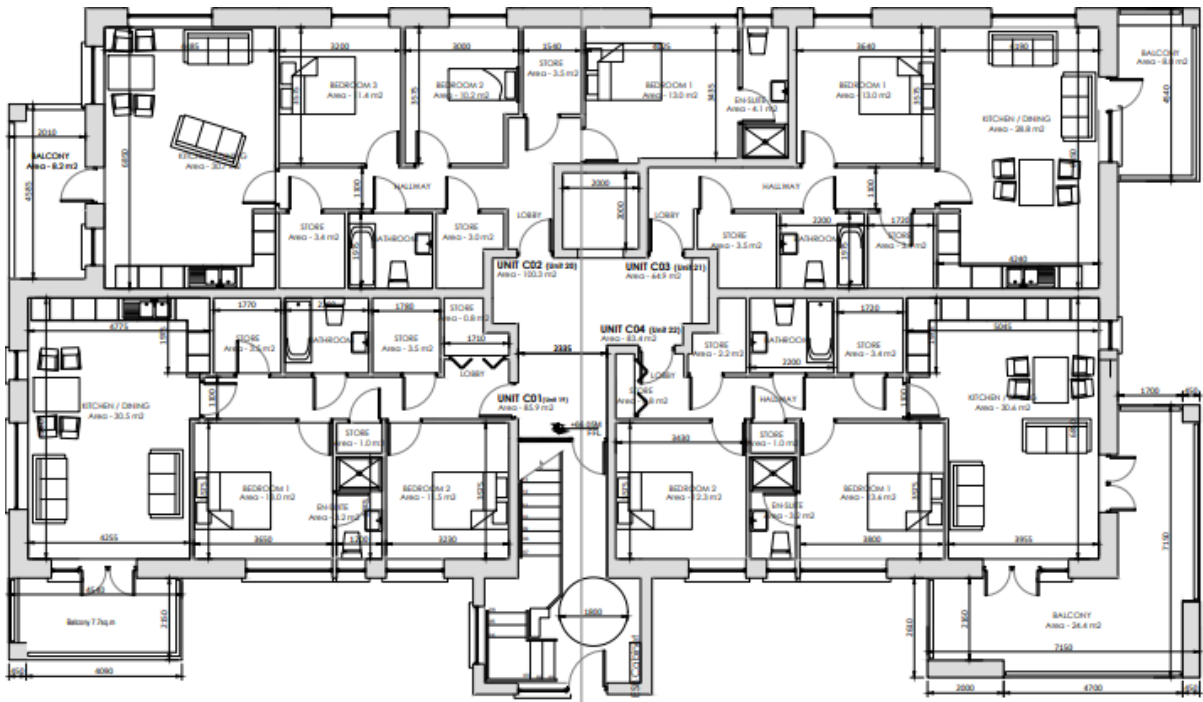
Proposed ground floor plan of Apartment Block C.
